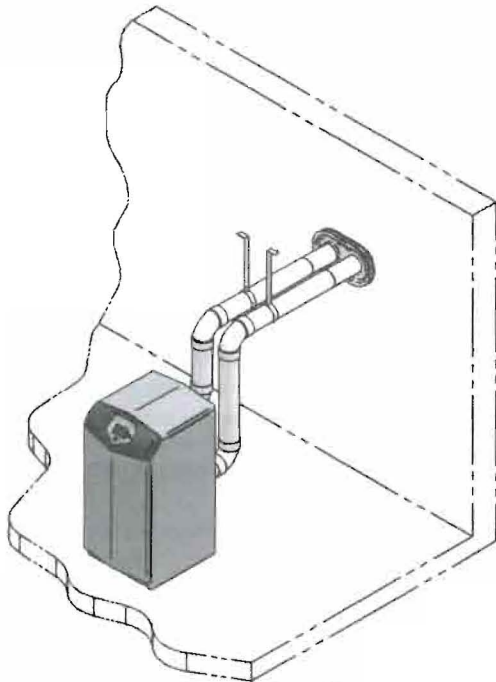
PVC/CPVC Two-Pipe Sidewall Termination - See page 21 for more details
